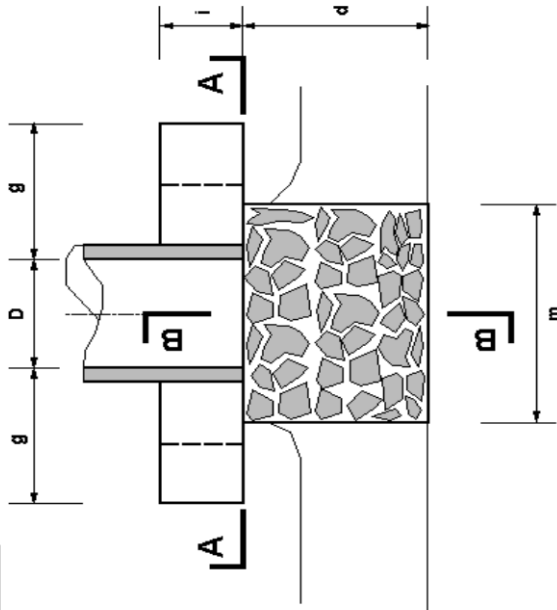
HEADWALL TYPE 3B (STONE MASONRY HEADWALLS)
